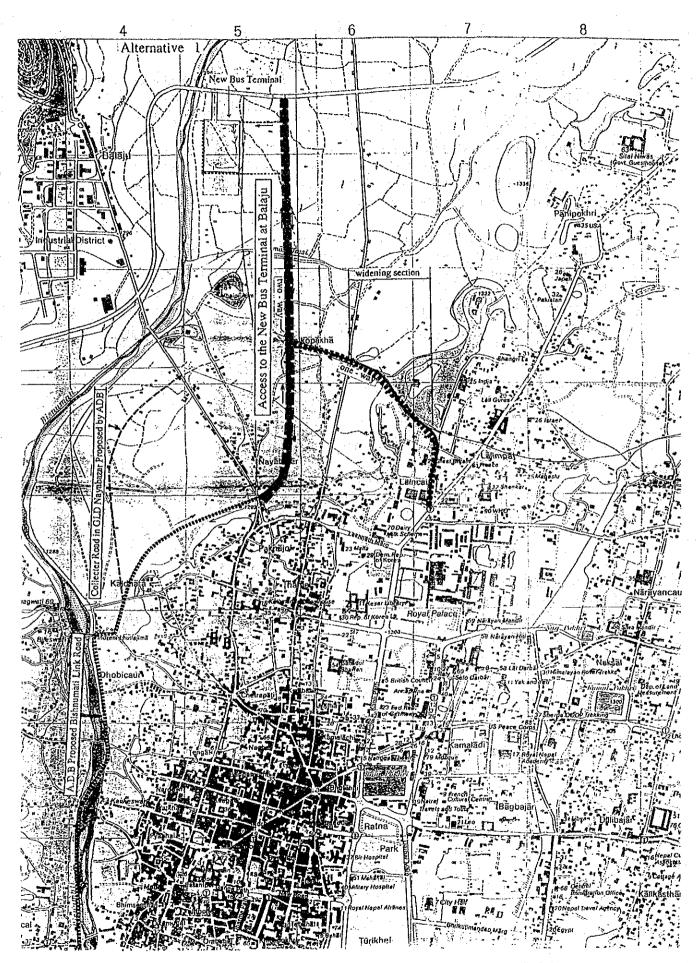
Construction of Access to the New Bus Terminal at Balaju
